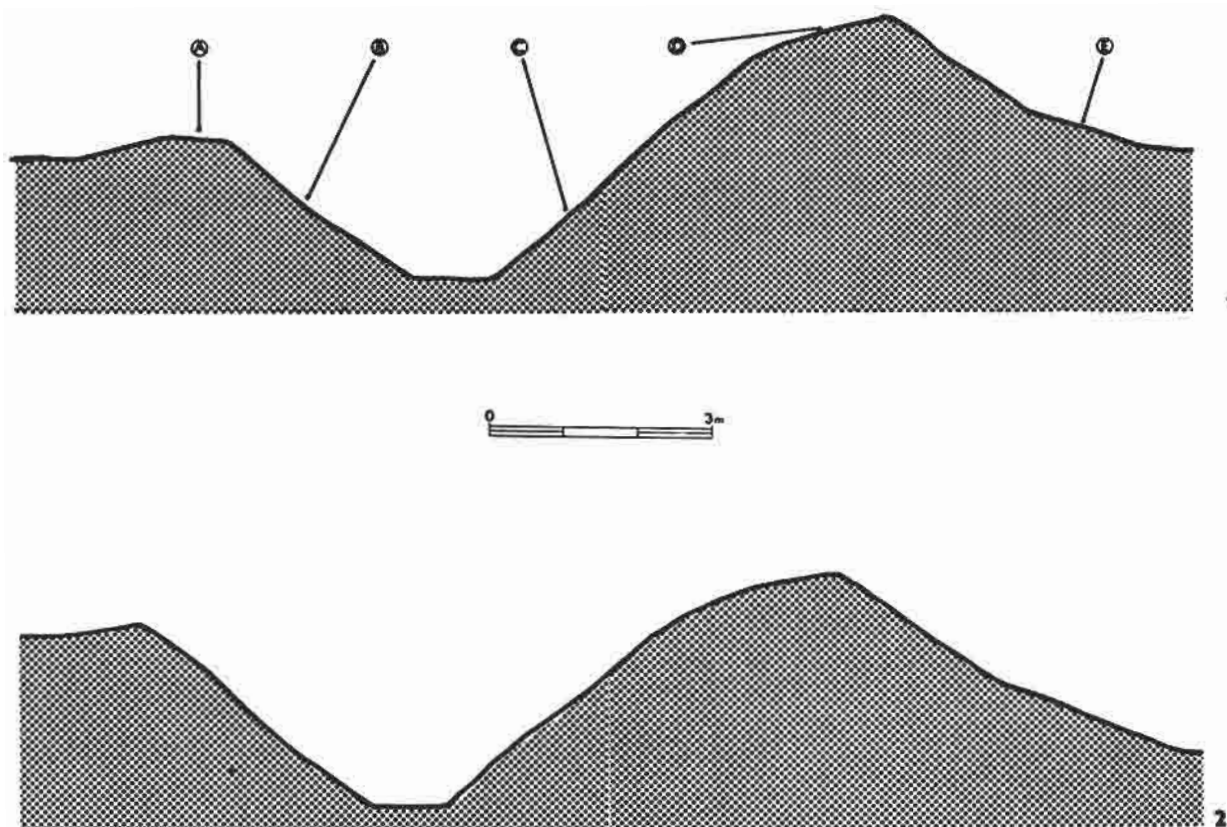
1. Section through the rampart and ditch: A - glacis, B - counterscarp, C - scarp, D - parapet, E - banquette. 2. Section through ditch and rampart B. - 1. Řez valem a příkopem: A - glacis, B - kontraeskarpa, C - eskarpa, D - parapet, E - banket. 2. Řez příkopem a valem B.
